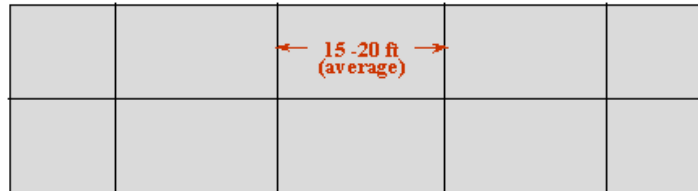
Longitudinal joint in Pavement Quality Concrete (PQC)
